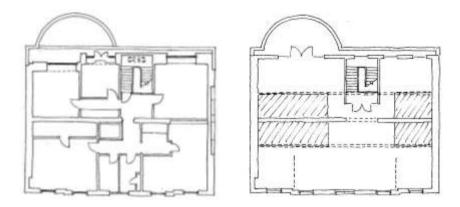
& 88: Second floor plan as existing (left) and diagrammatic plan as proposed (right)
